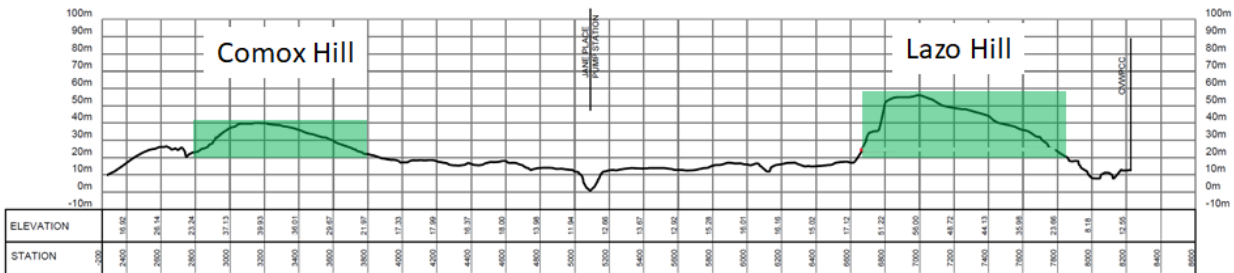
Topographic profile of the trenchless sections. Green shading represents feasible elevations of the trenchless alignments based on current understanding of groundwater conditions.
